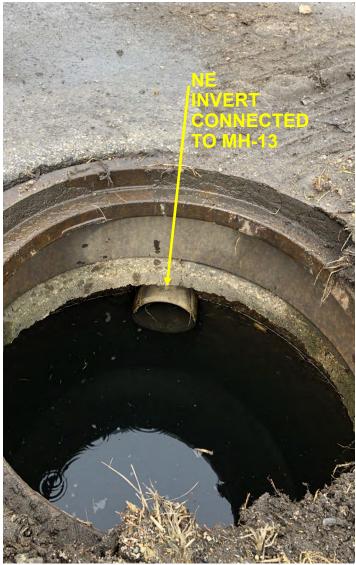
Manhole MH-16 interior with visible NE invert connected to manhole MH-13 and high water level. View to northeast; photograph taken on April 7, 2022.
